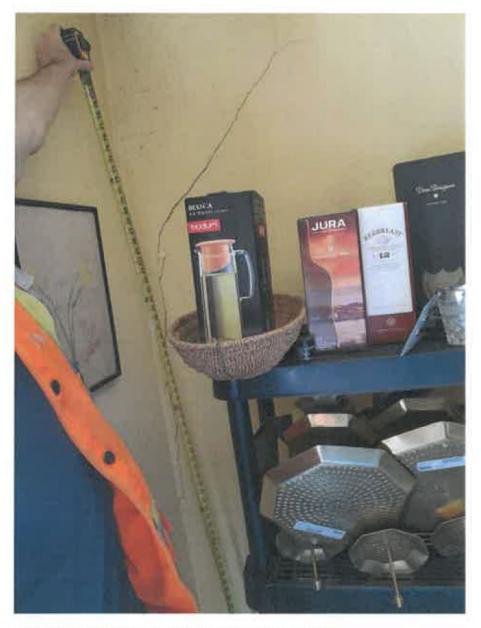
Cracking on the southern side of the third floor.
